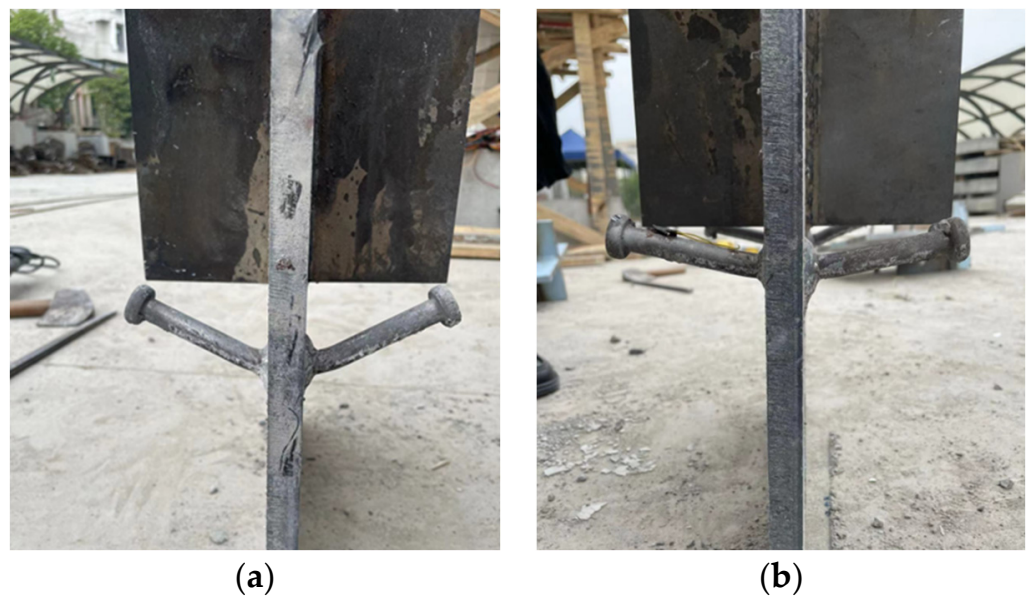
Stud failure pattern. (a) P-14-S specimen; (b) P-22-S specimen.
